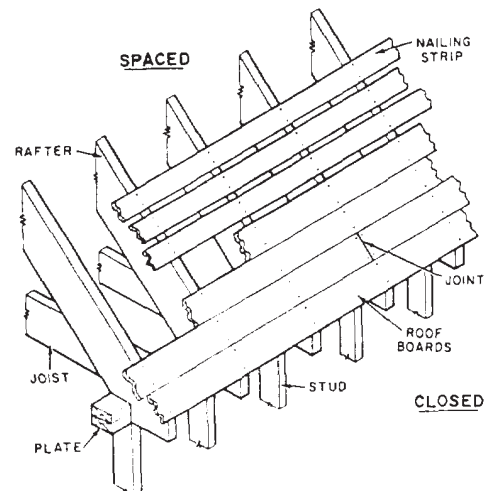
Typical board roof sheathing, showing both closed and spaced types.
